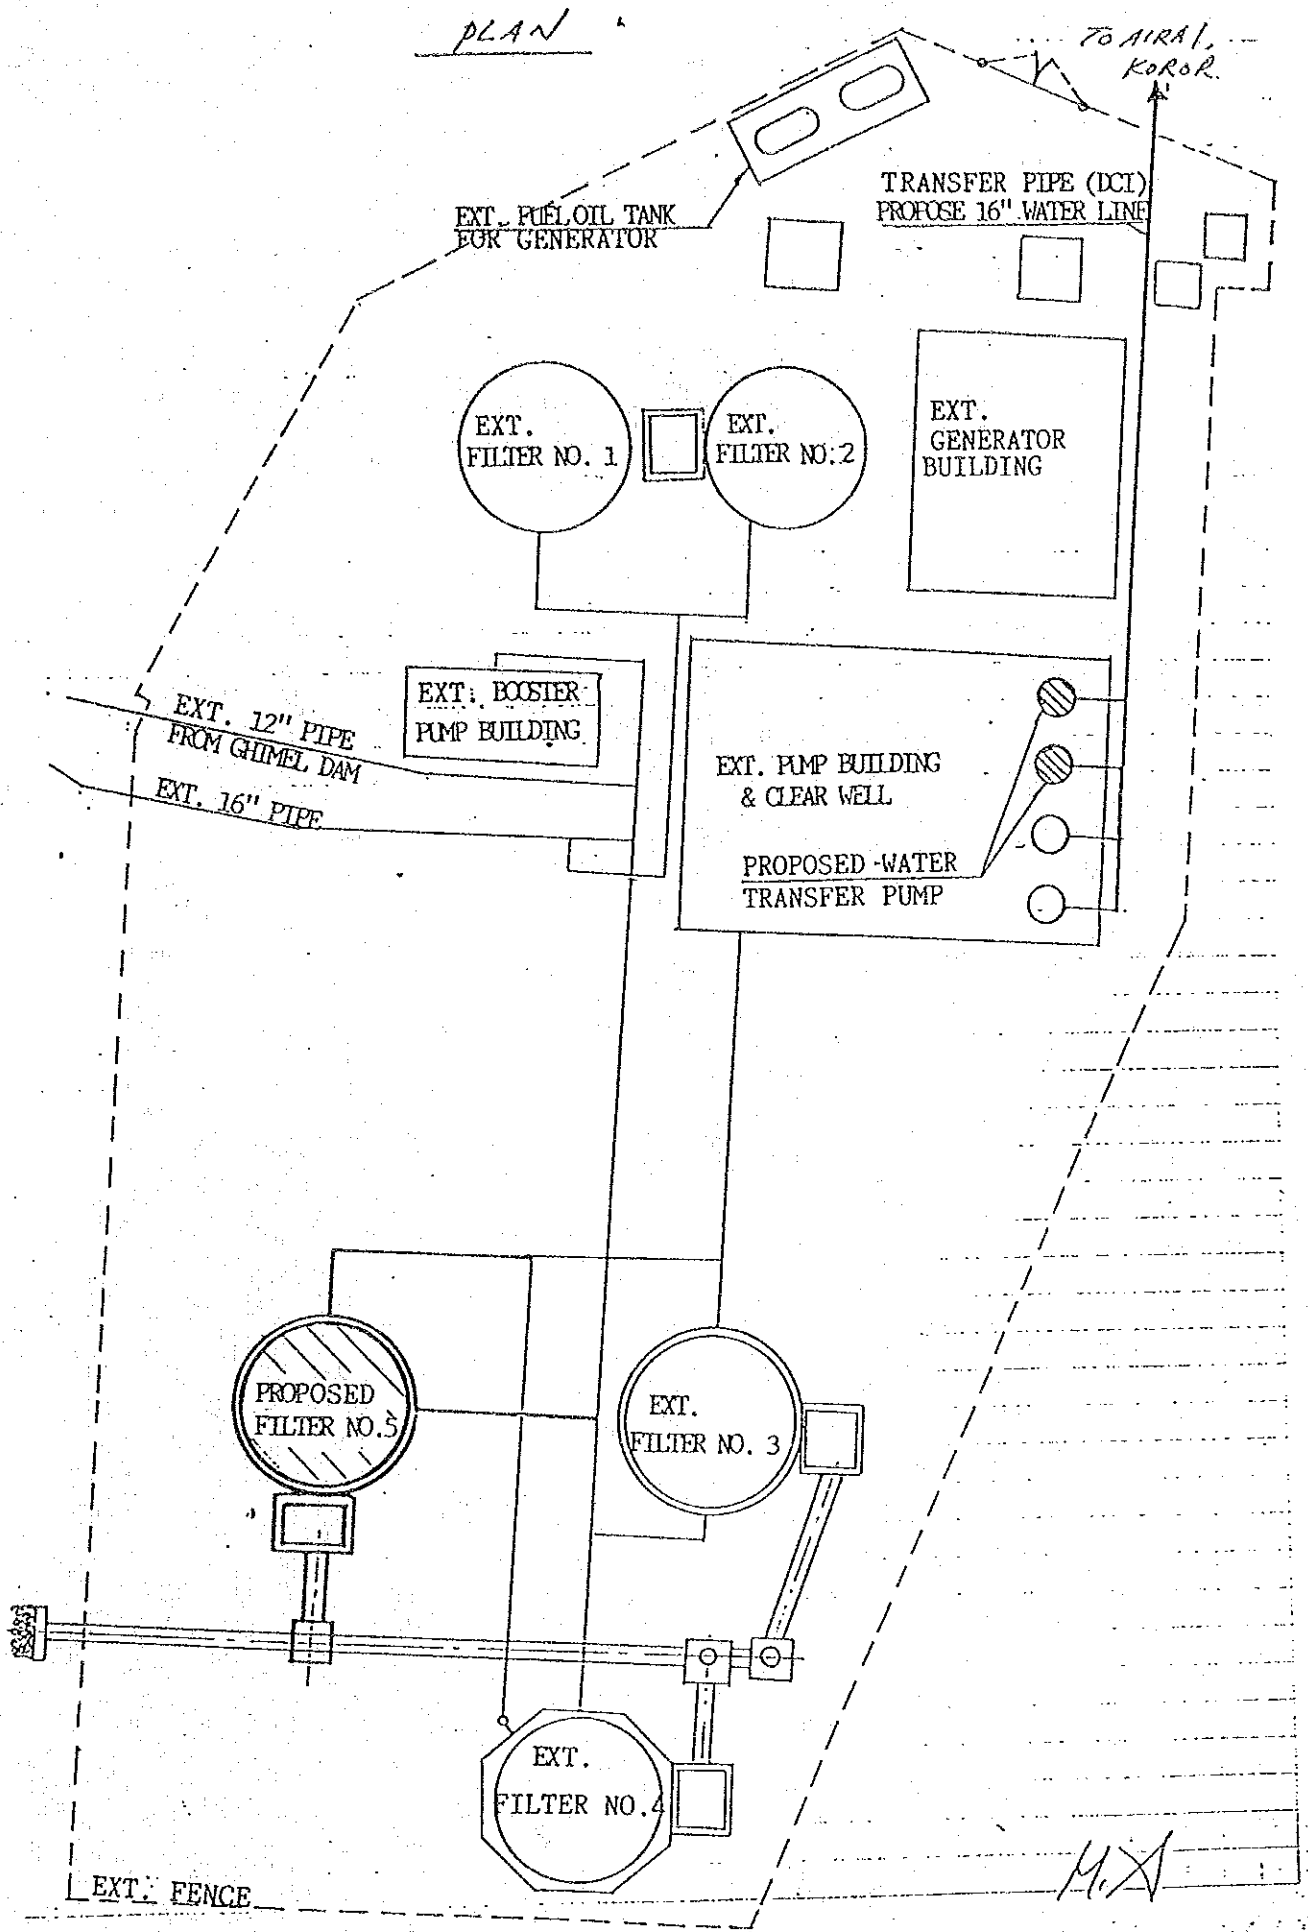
PLAN FOR PROPOSED FILTER NO. 5
